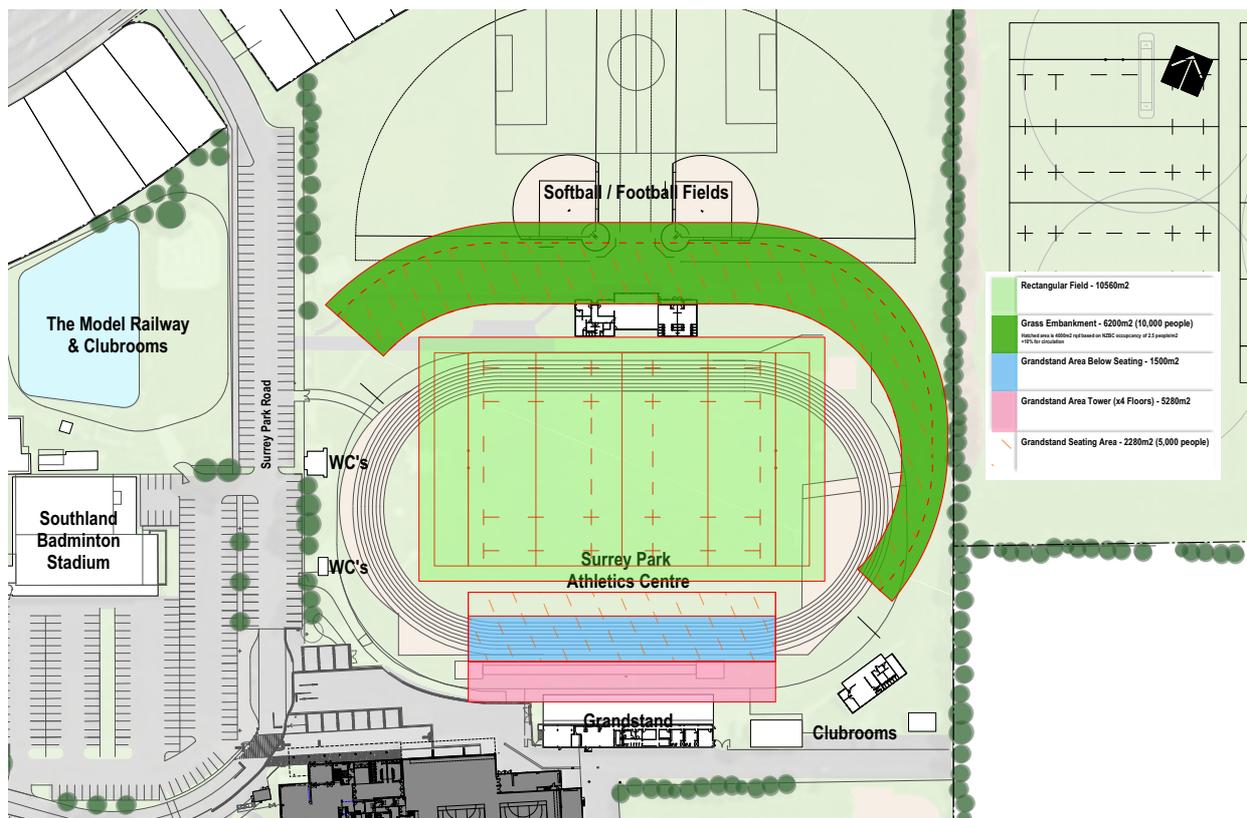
Option 2 Premier Rectangular Stadium Overlay Plan
